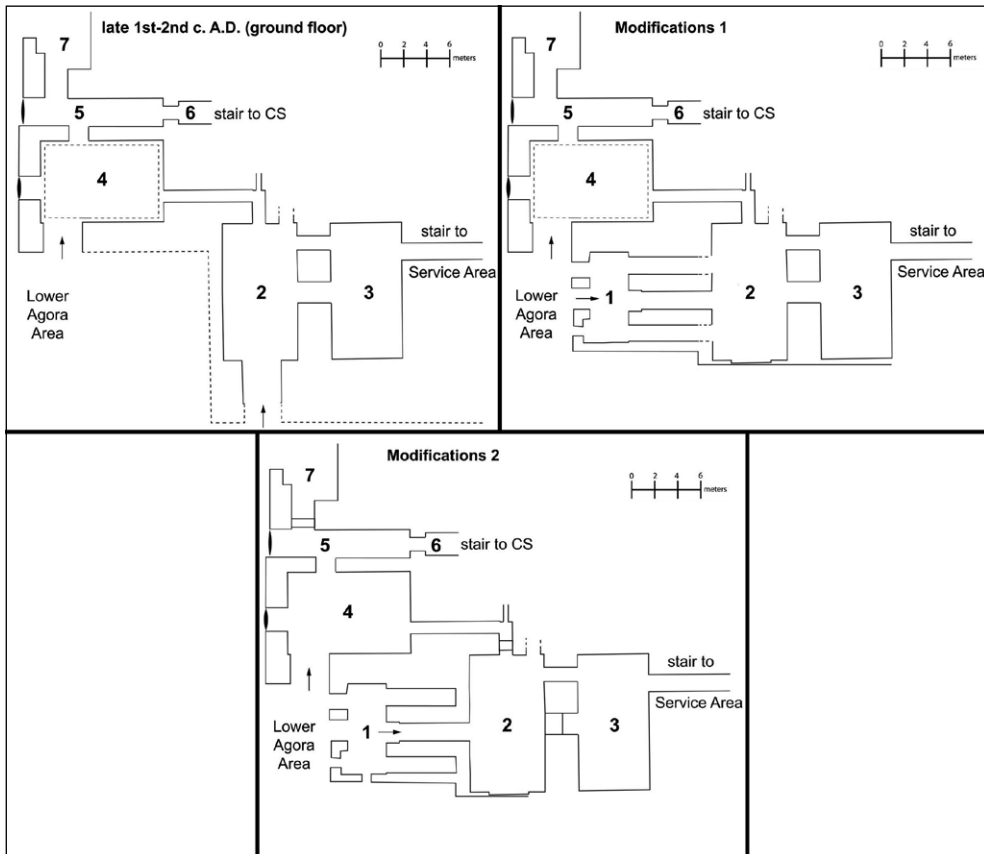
Maps of the late 1st – 2nd c. A.D. ground floor and subsequent modifications, adapted from a drawn plan by David Depraetere.
